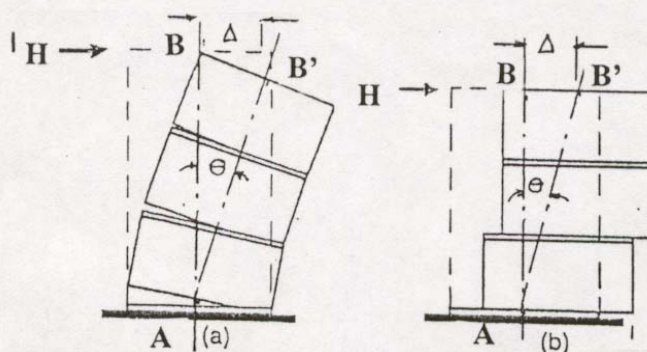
Undesirable deformations along horizontal joints:
